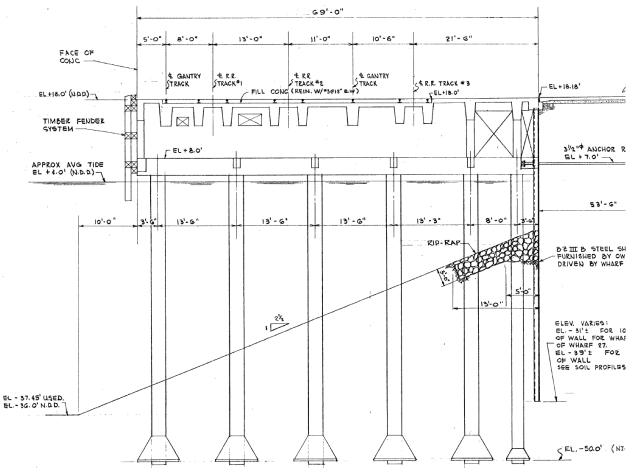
Typical cross-section through CD 26, reproduced from PHA drawings.
